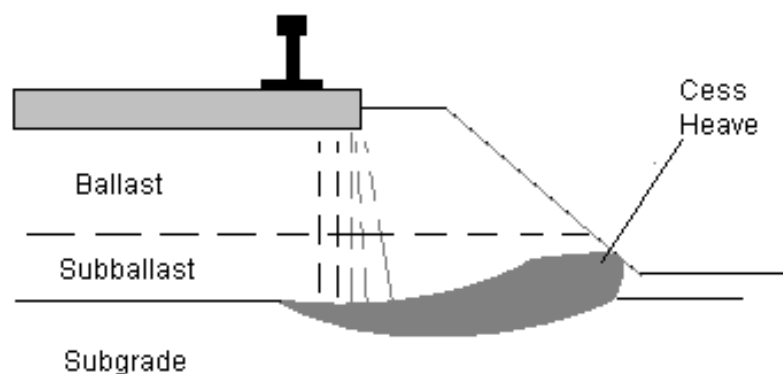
Forming of cress heave due to subgrade shear failure
